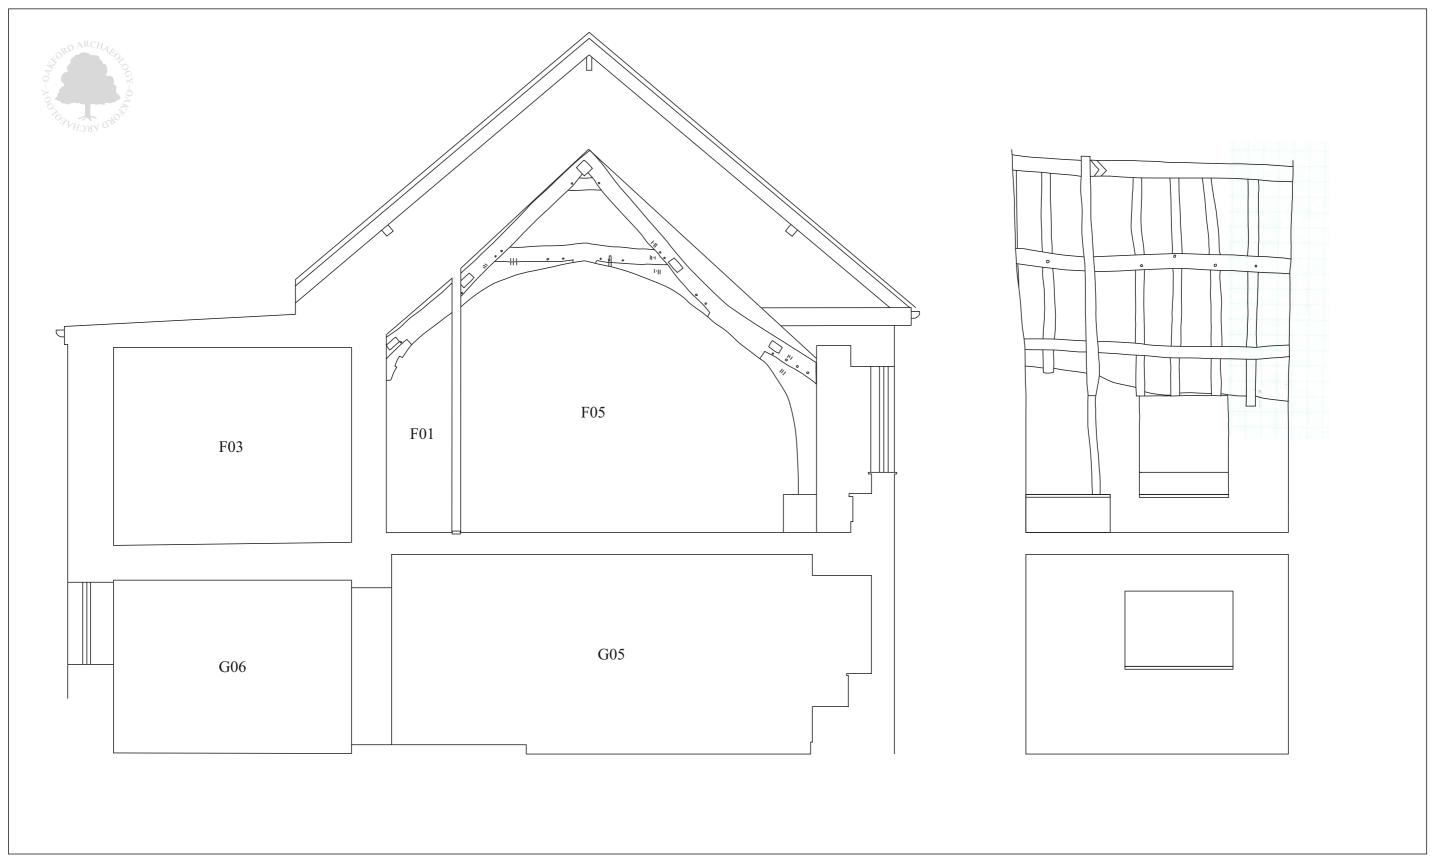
East and south elevations of Bell House showing jointed cruck truss in the former hall and side view of the south side of the medieval roof.
